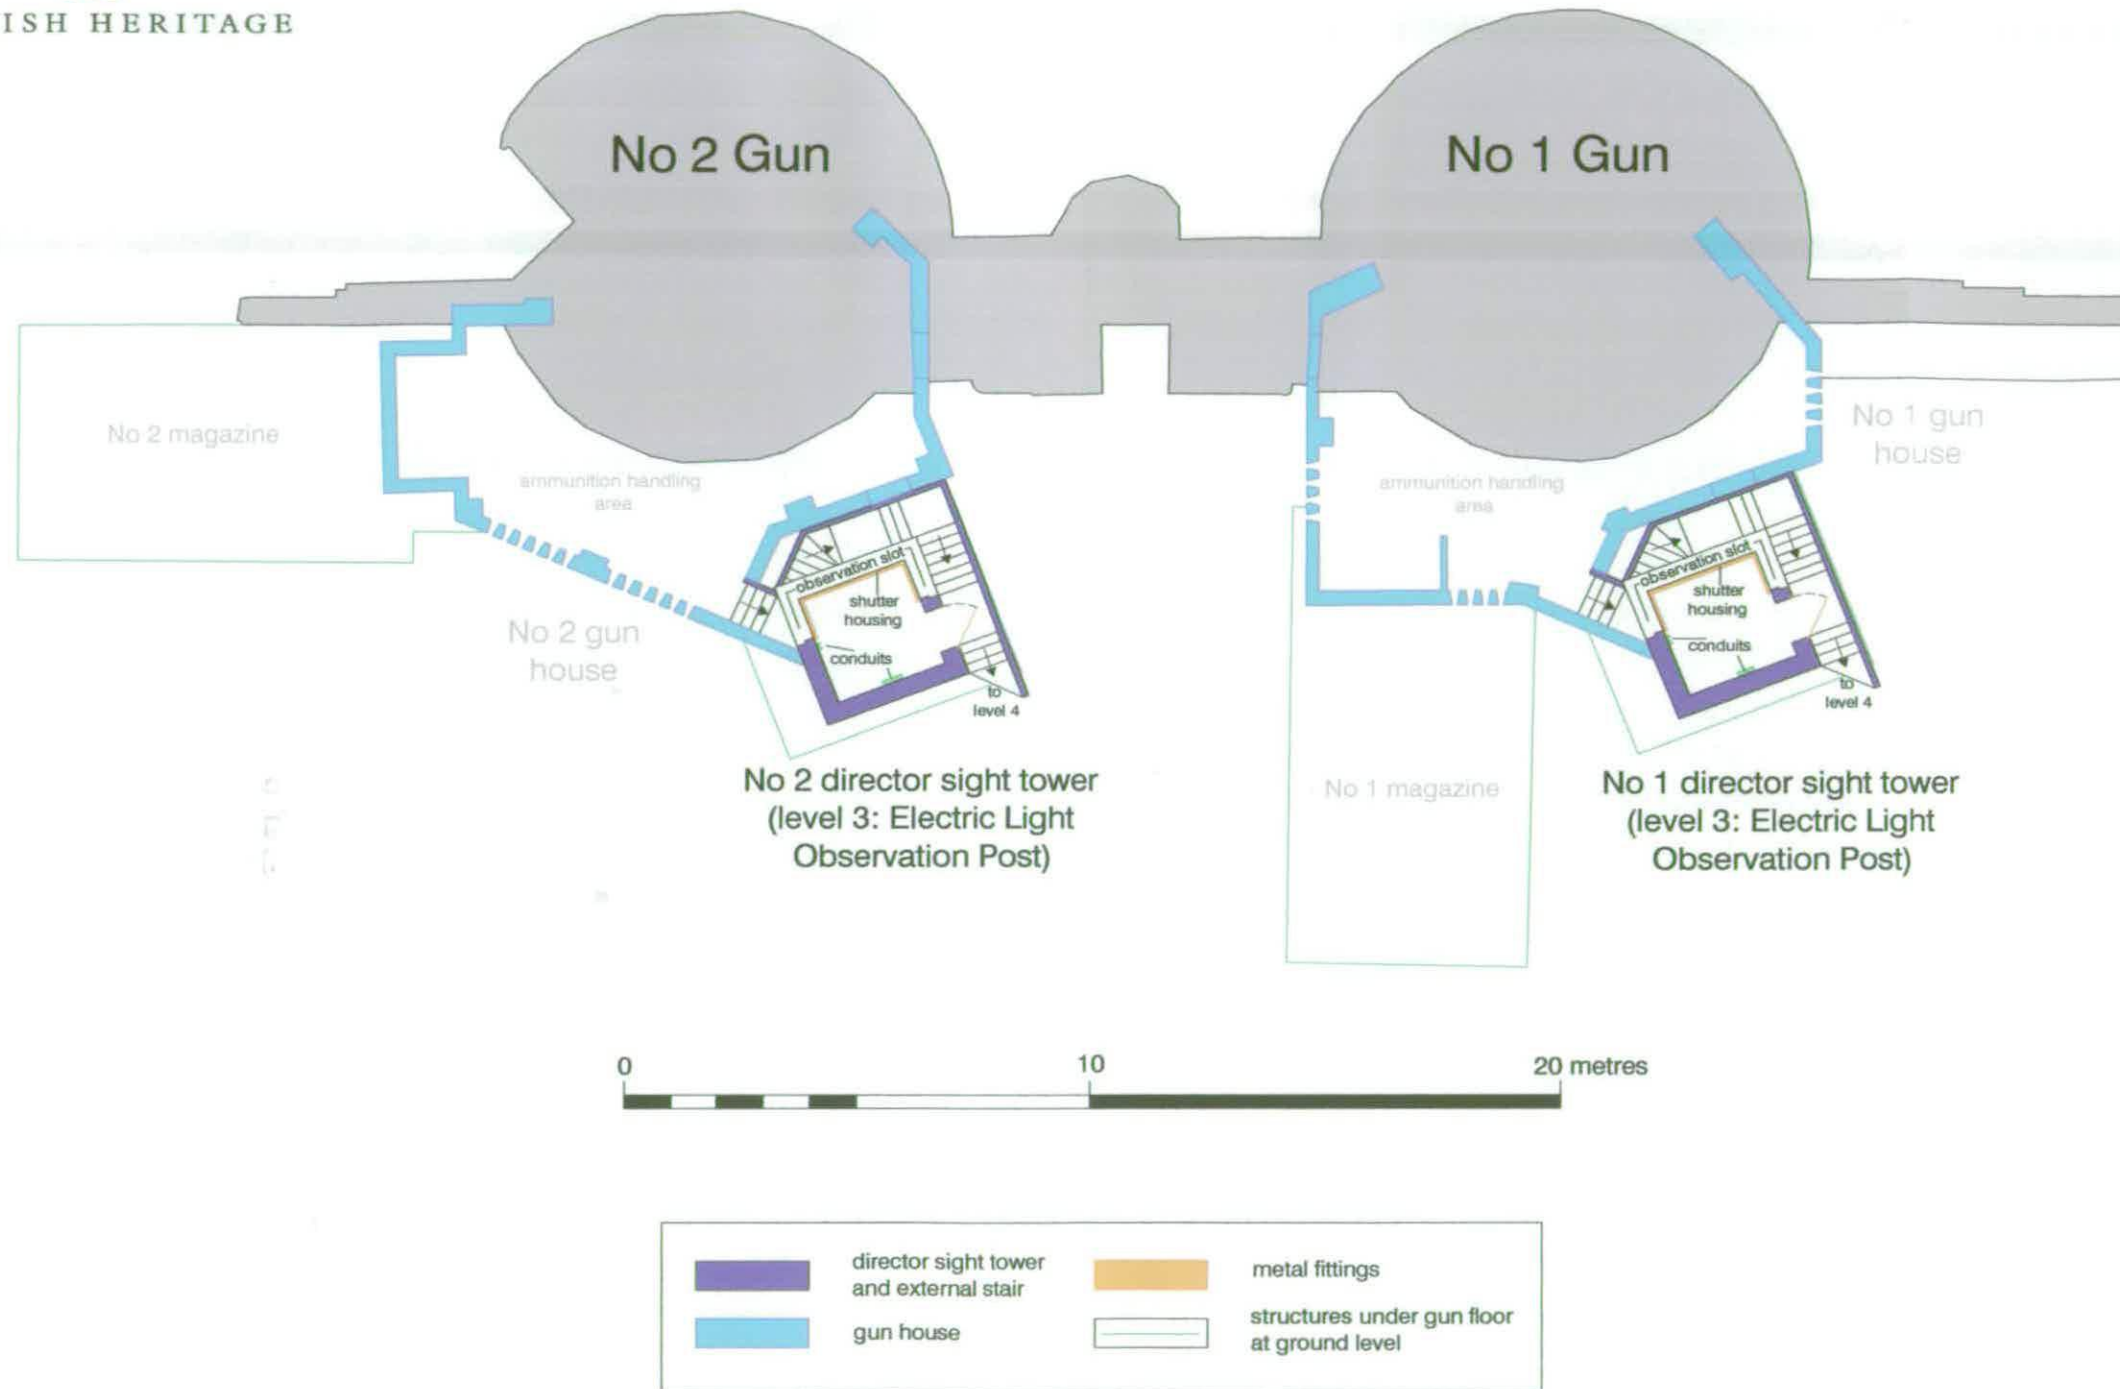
Darell's Battery twin 6-pdr equipment; detailed plan showing level 3 of the director sight towers
